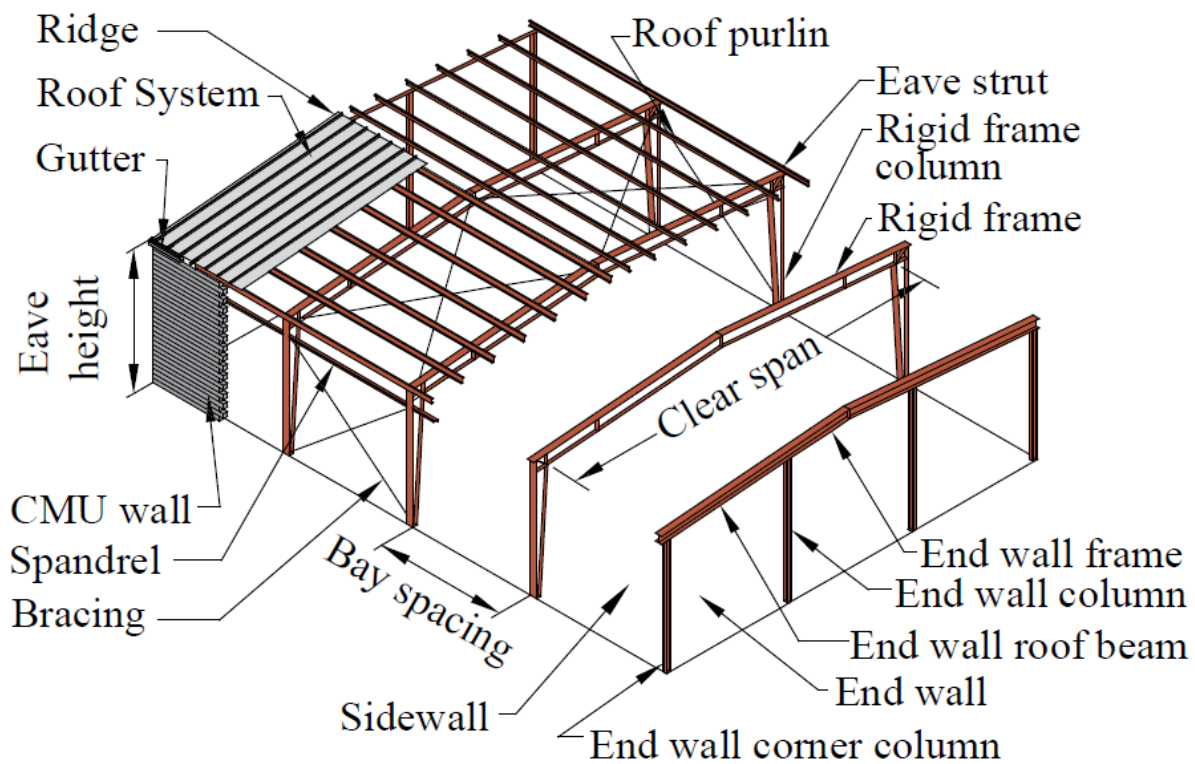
Typical Components of a Metal Building System clad with Masonry Wall (NCMA 2011)
